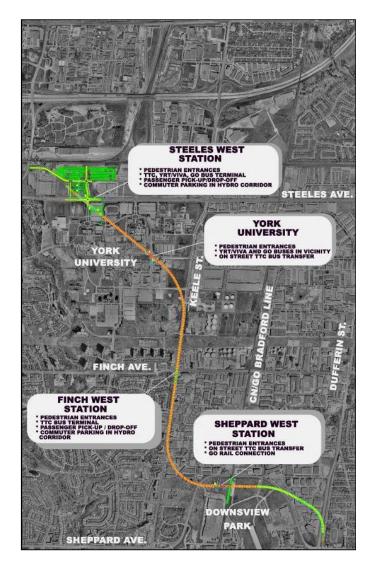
OVERALL VIEW OF THE PROPOSED SUBWAY EXTENSION ALIGNMENT AND PROPOSED SUBWAY STATIONS
